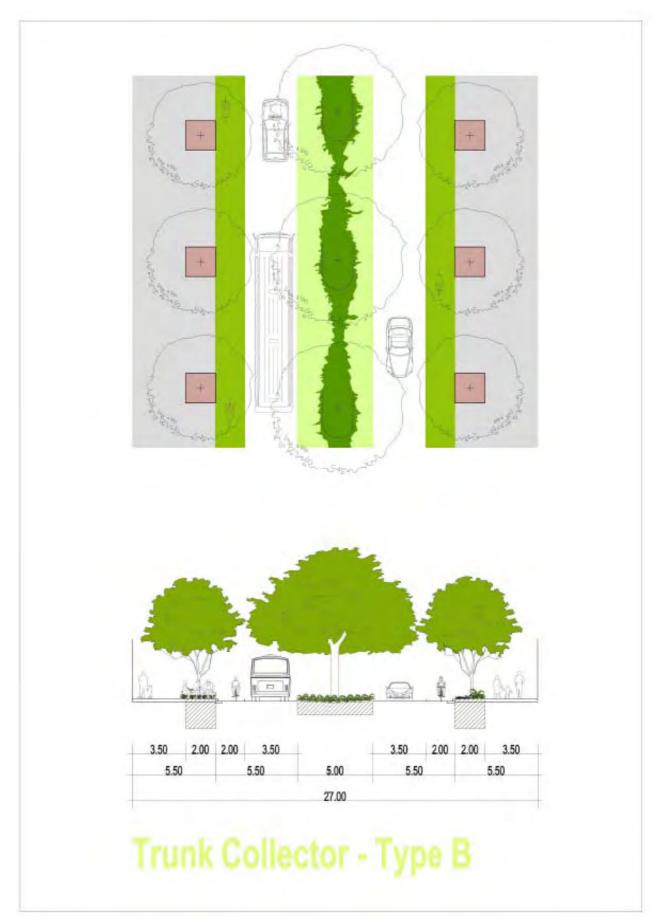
(b) Trunk Collector Road Type B Typical Cross Section
